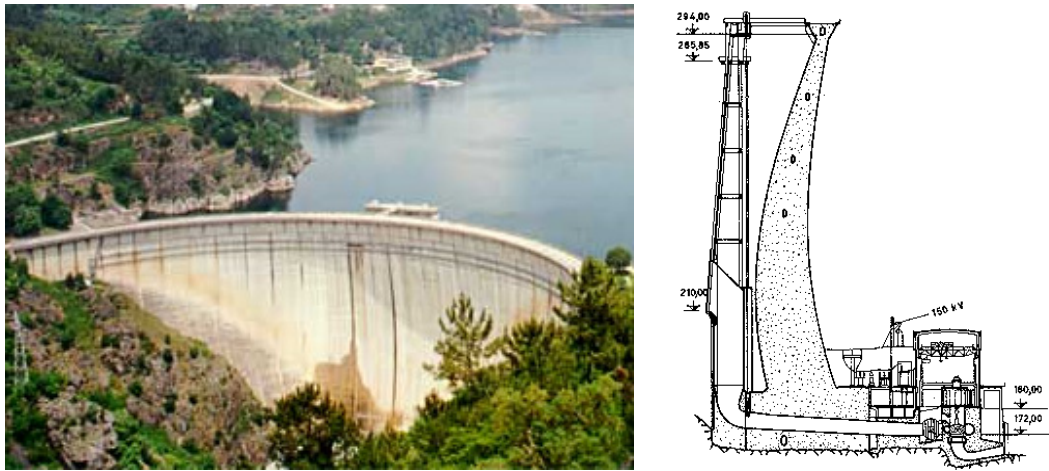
Cabril dam. Downstream view and cross section of the central cantilever.
